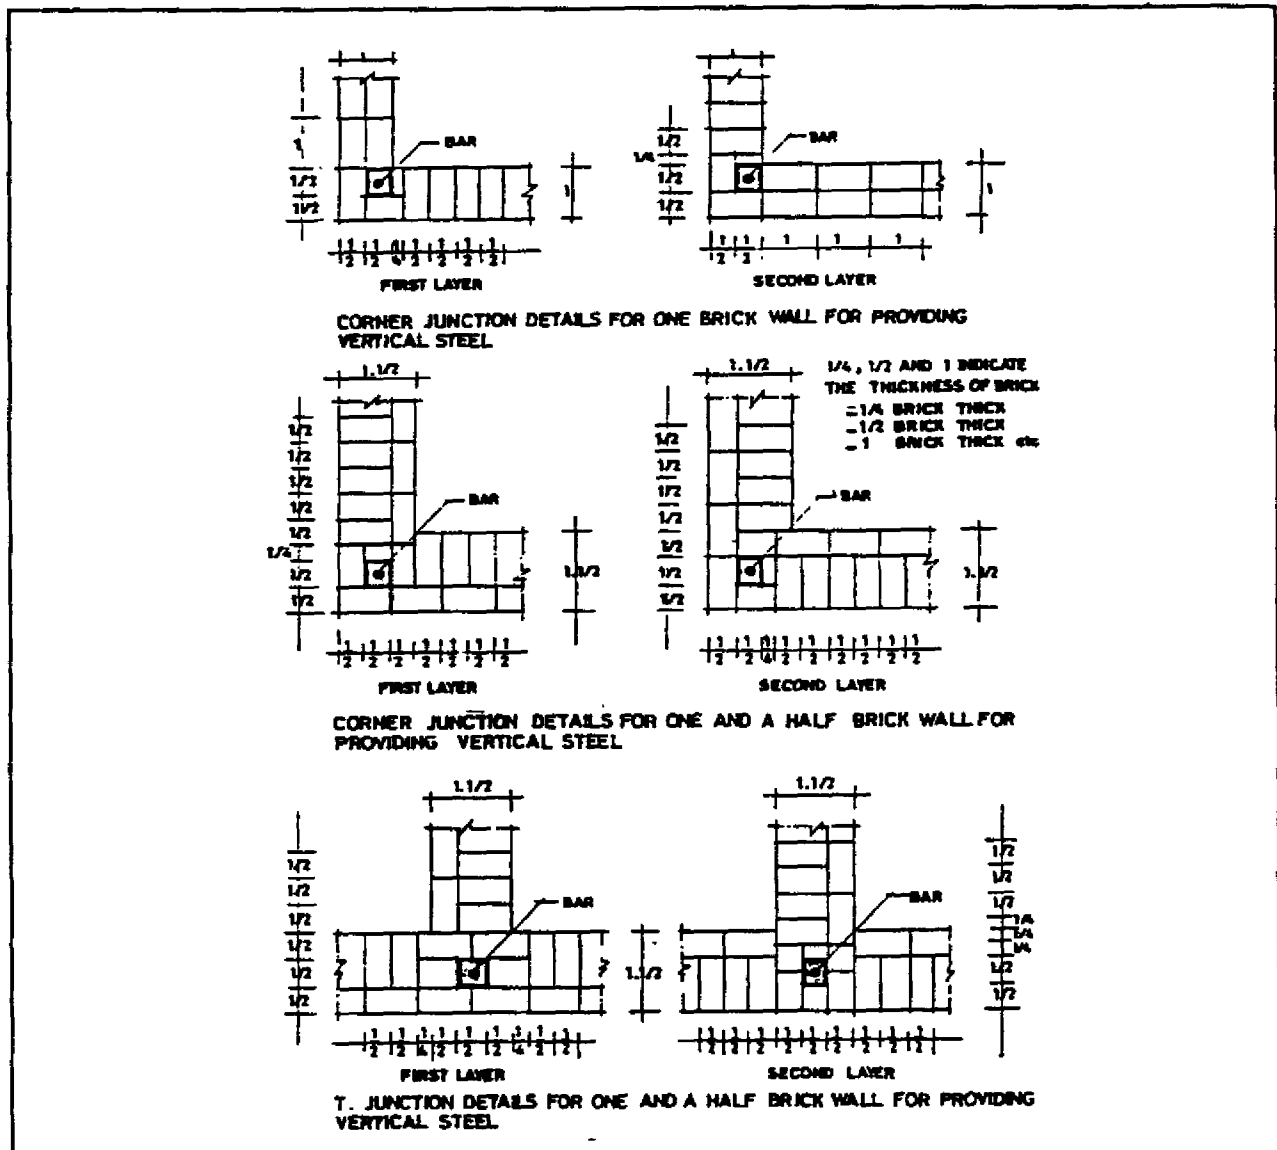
Vertical Reinforcement in Masonry Walls [1].
